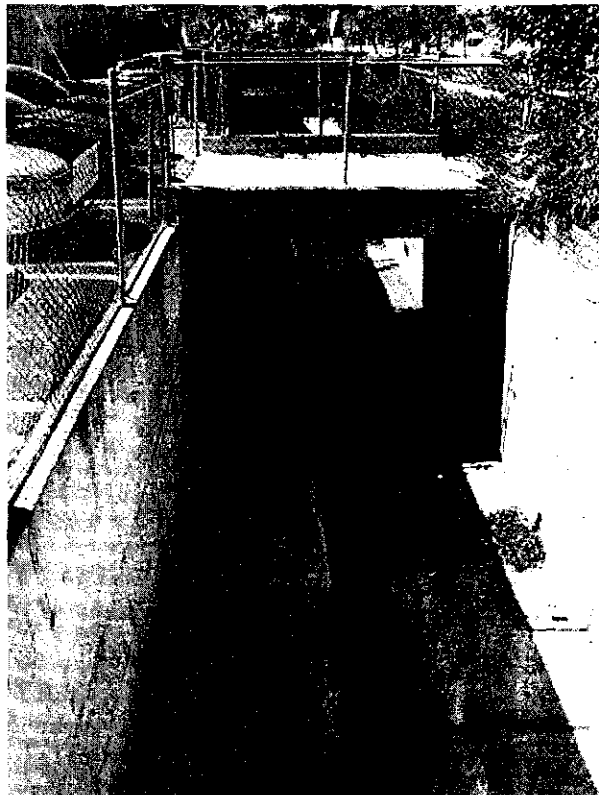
Looking downstream from Laguna Canyon frontage road bridge near Sawdust Festival site (open 15' x 8.5' rectangular RC channel).
